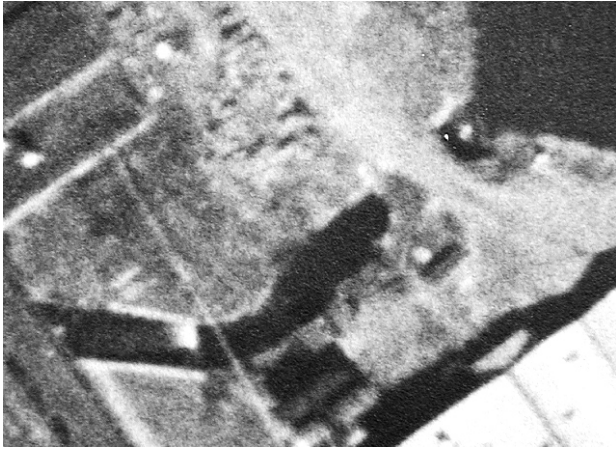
View looking north-west at deep erosion induced collapse of northern half of earth filled and cut stone clad 1874 arched bridge at Furnace Pond Dam(*Photo courtesy of NJDEP*)
